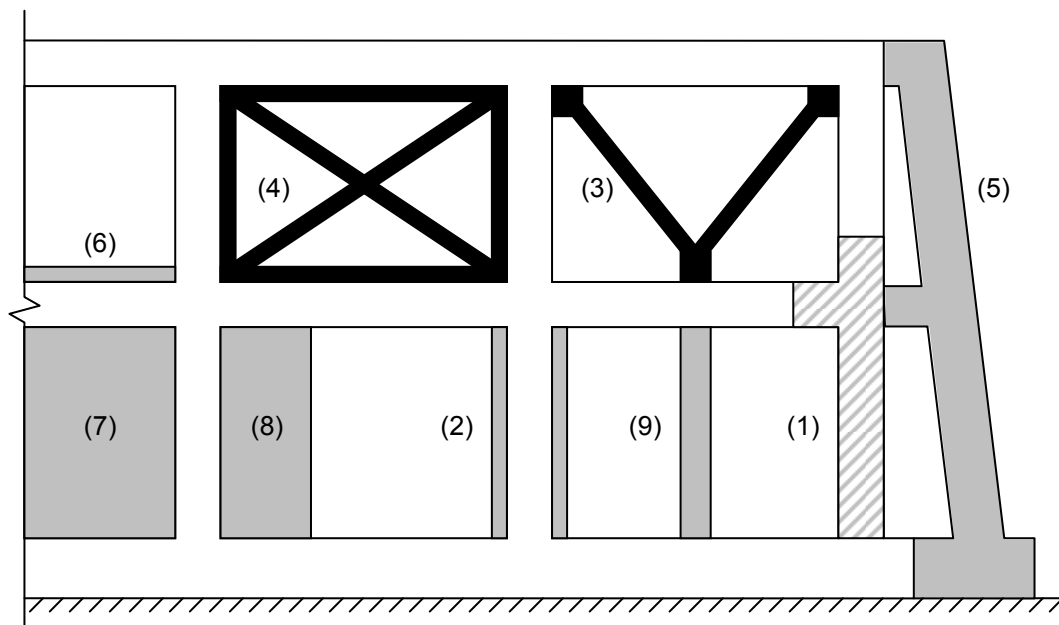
Overview of most common seismic retrofitting schemes for reinforced concrete structures
